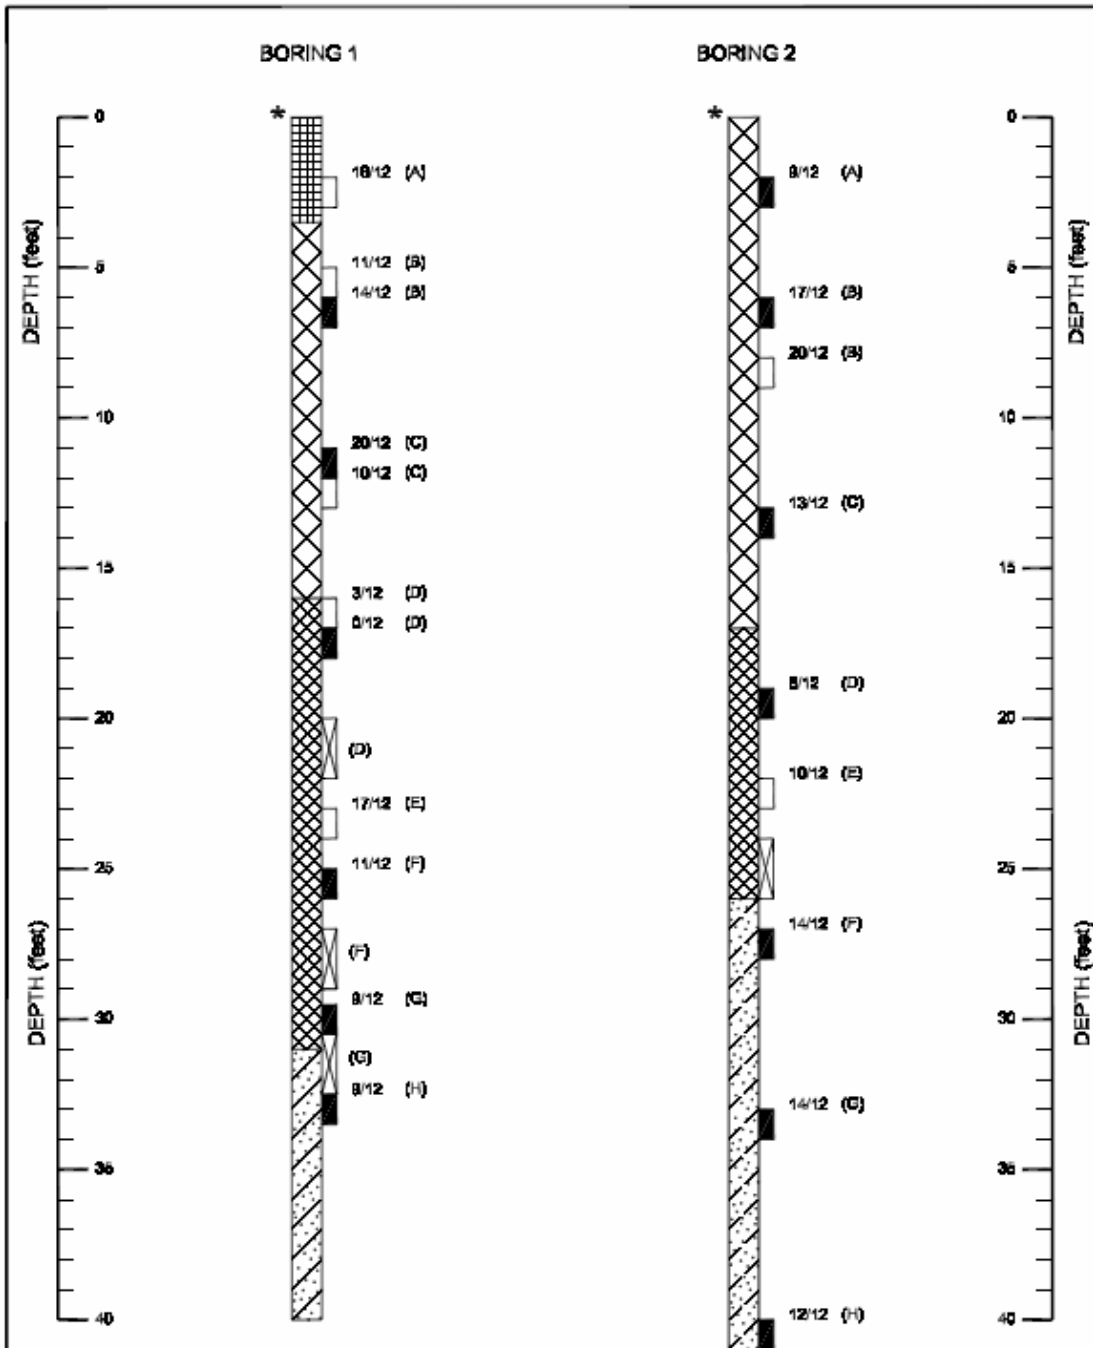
Elevation Profiles of the Eastern Approaches to the I-70/I-225 Structure.
